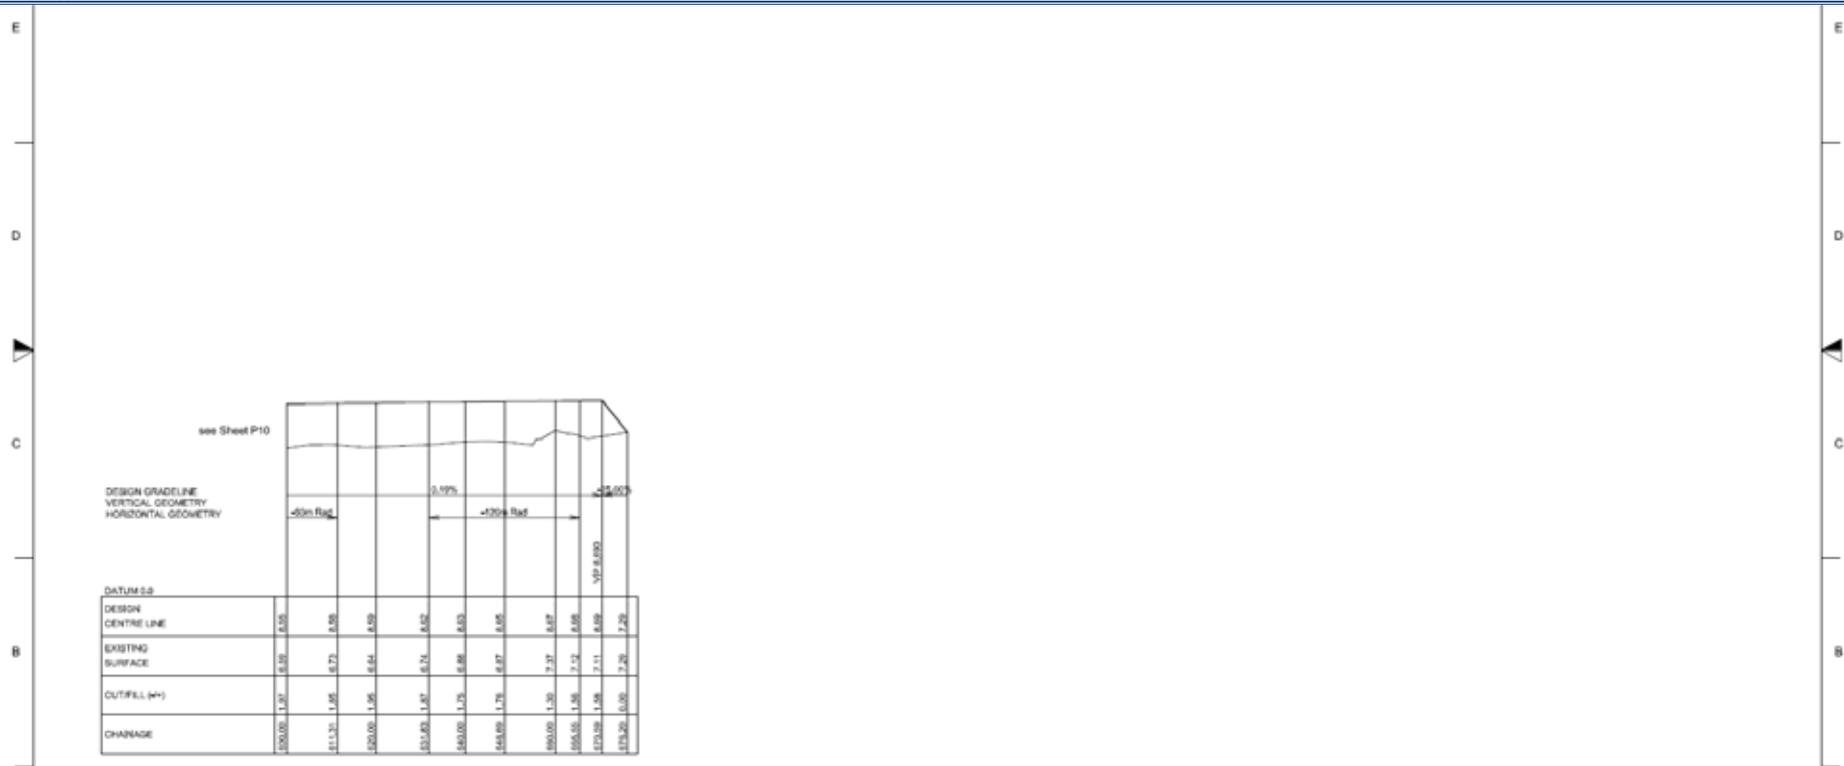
Longitudinal Section 2 from Ch.600 to Ch.676
